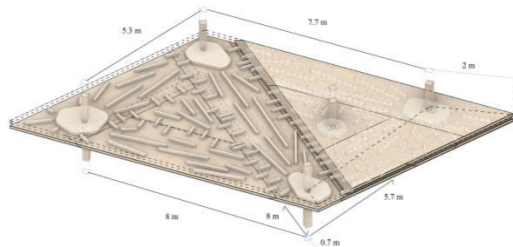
Multi-directional hollow slab timber building system with internal shear webs.
